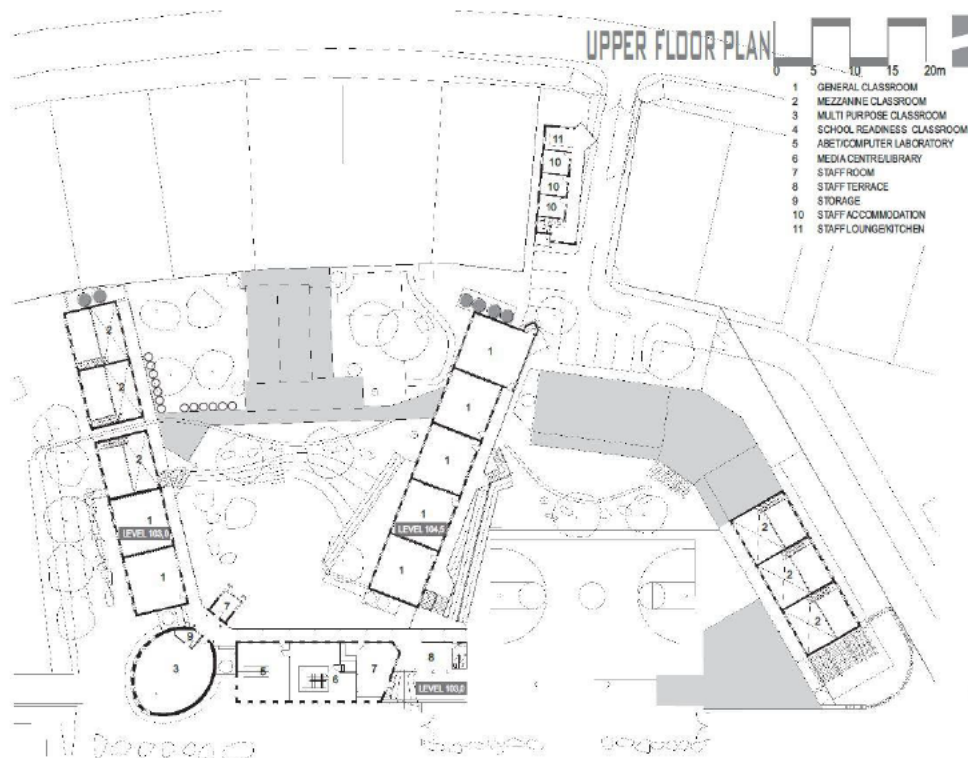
1st Floor plan of Seven Fountains School, Source: <https://www.eastcoastarchitects.co.za>
